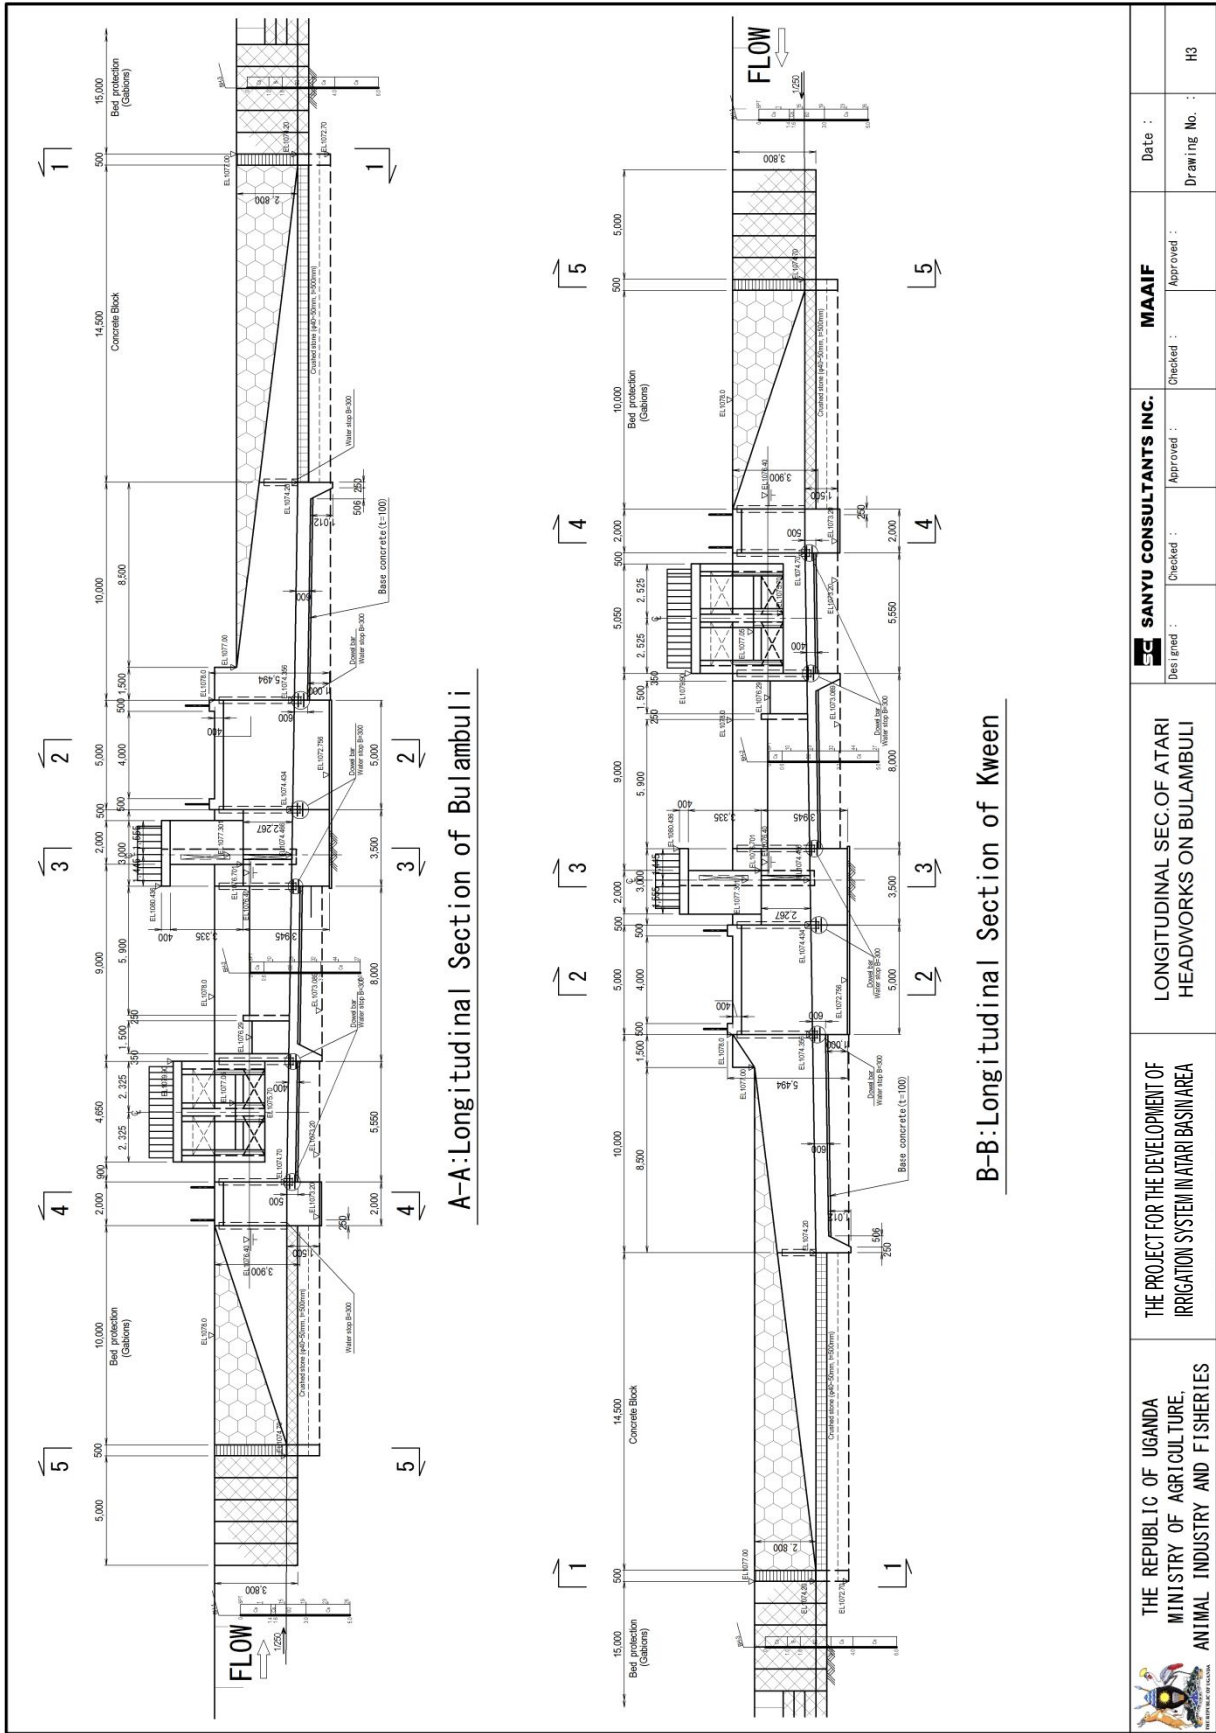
General Plan of Headworks (2/3)
